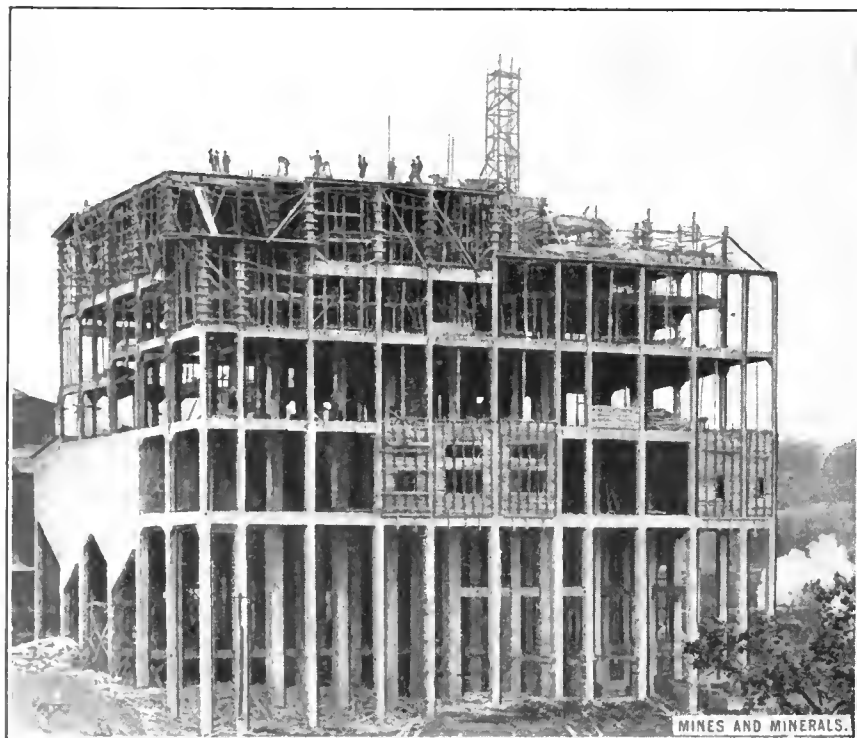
TAYLOR CONCRETE BREAKER IN COURSE OF CONSTRUCTION
